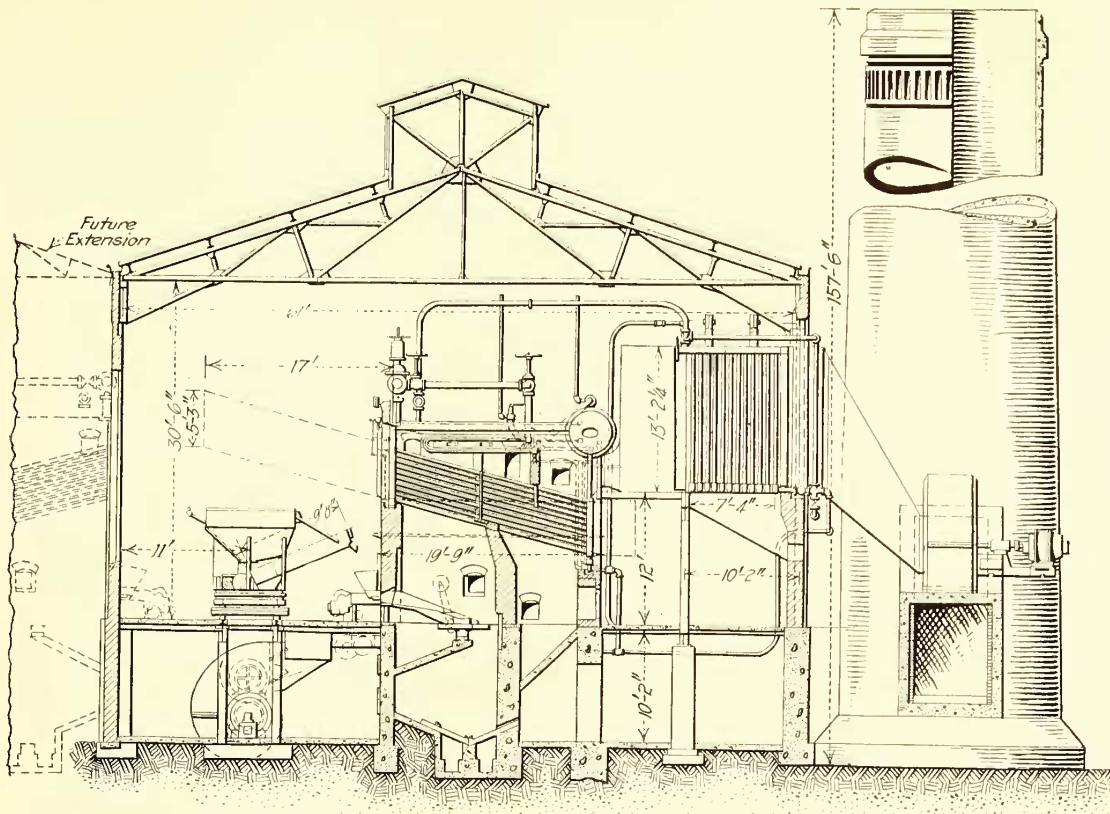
CROSS-SECTION OF BOILER ROOM SHOWING ARRANGEMENT OF EQUIPMENT AND SCHEME FOR EXTENSION
